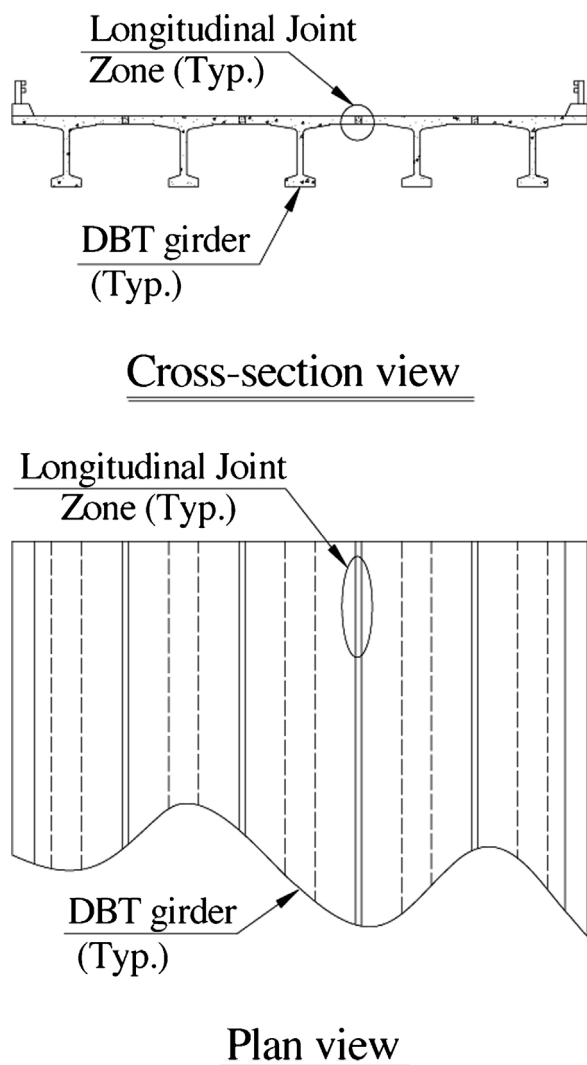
A bridge consisting of 5 typical DBT girders connected by 4 longitudinal joints.
